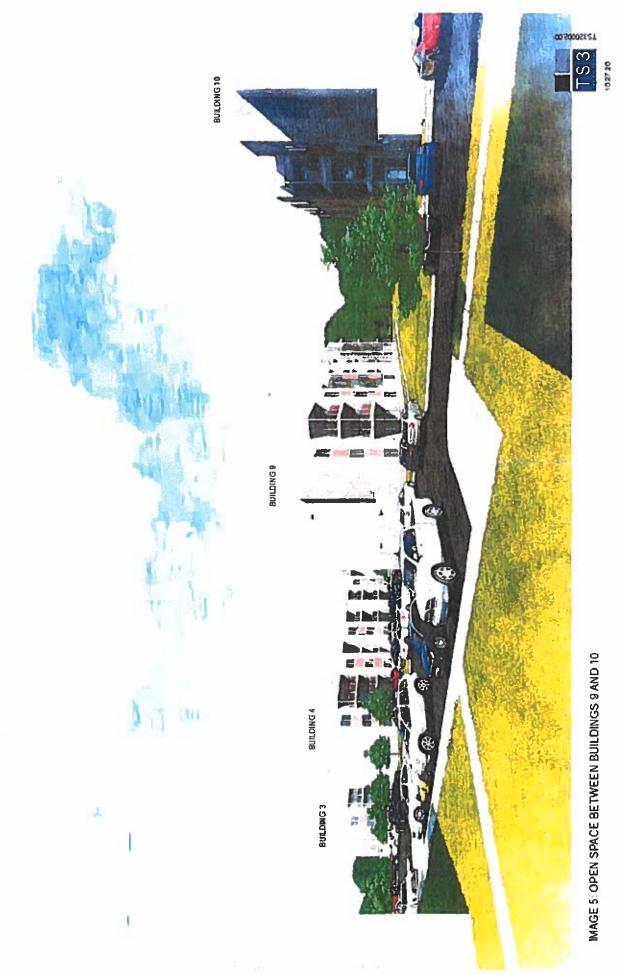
OPEN SPACE BETWEEN BUILDINGS 9 AND 10
